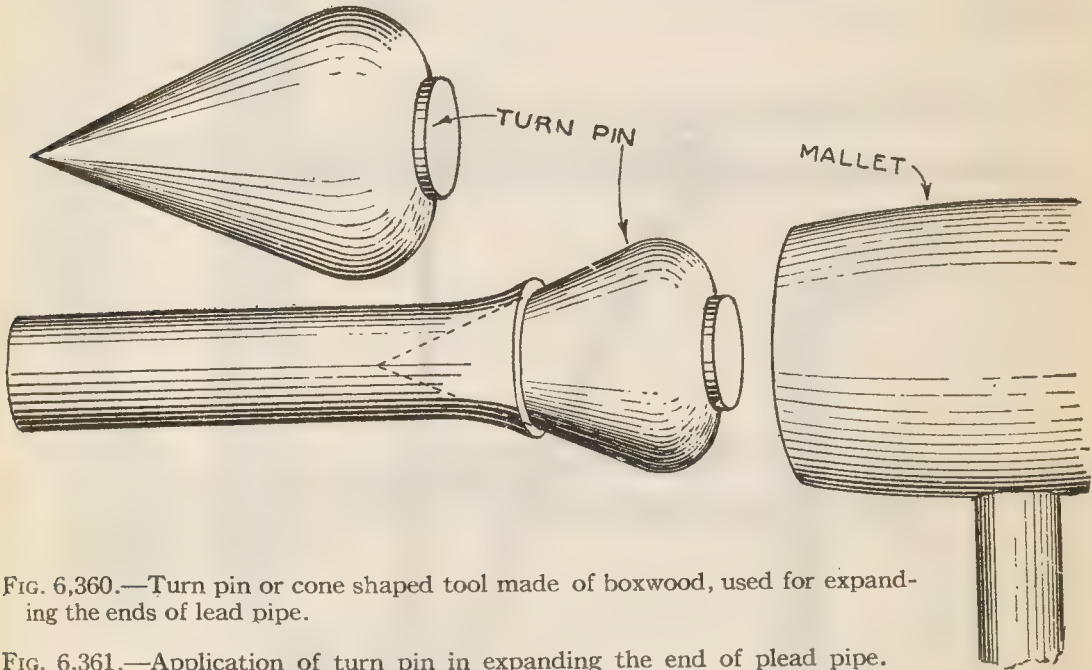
,360.—Turn pin or cone shaped tool made of boxwood, used for expanding the ends of lead pipe.
